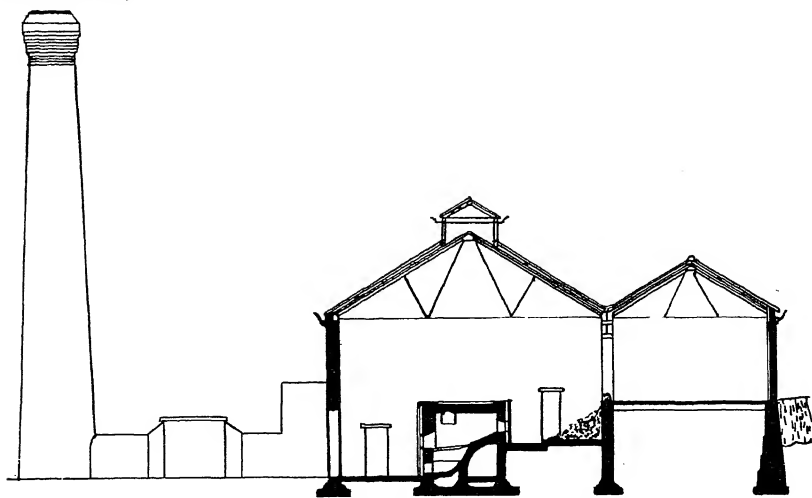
Horsfall's Back-fed Destructor at Dunoon. Longitudinal section.
